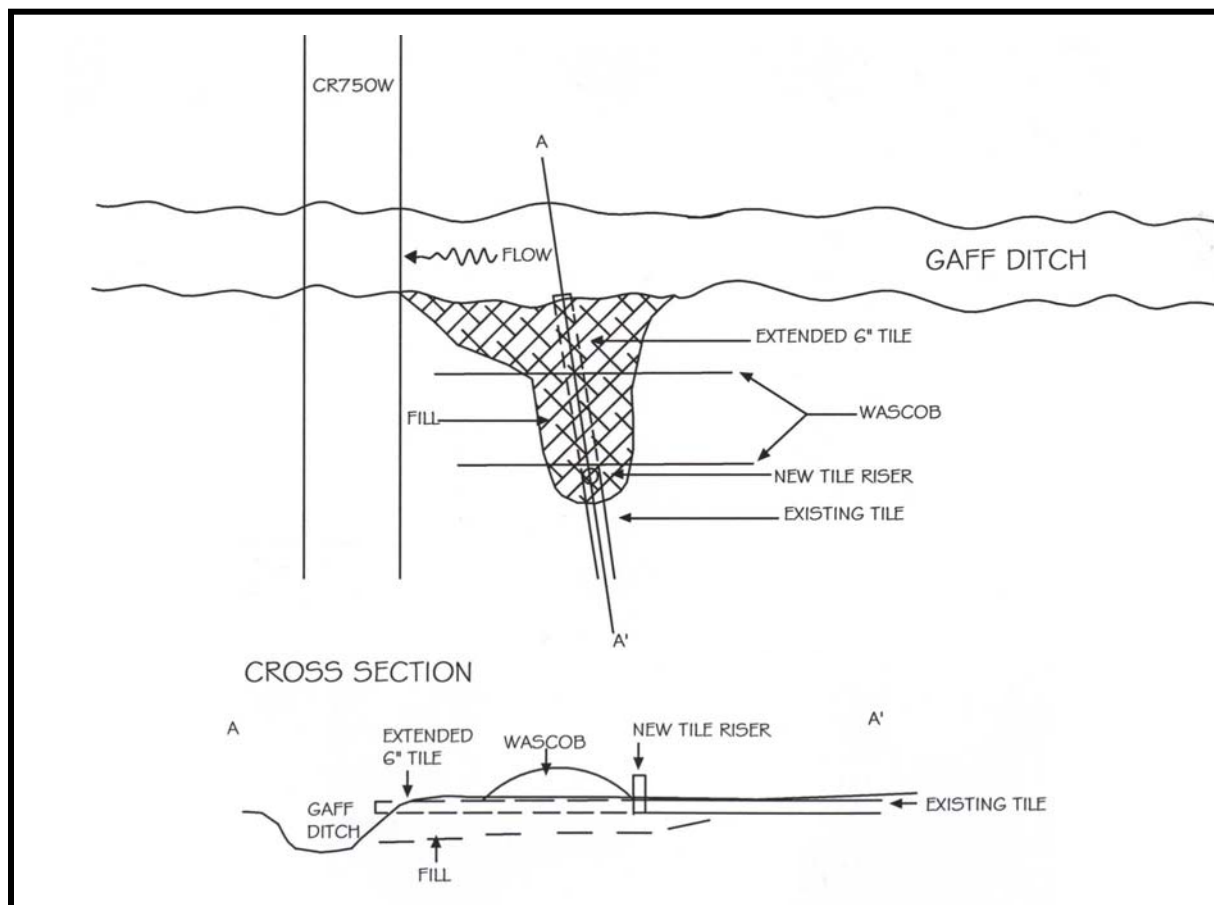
WESCOB construction conceptual design, southeast corner of County Road 750 West project site.
